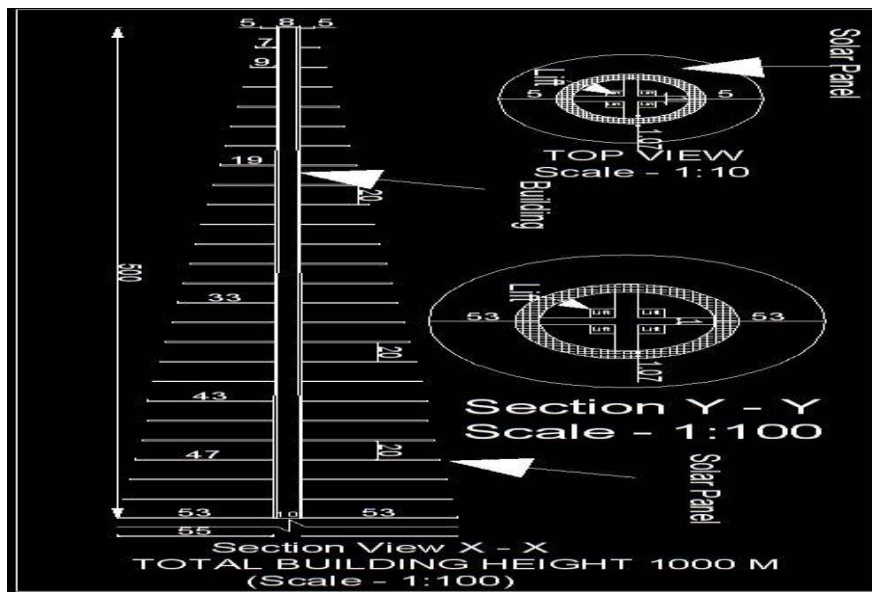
Section view of the top 500 metres and framing arrangement for solar panels
